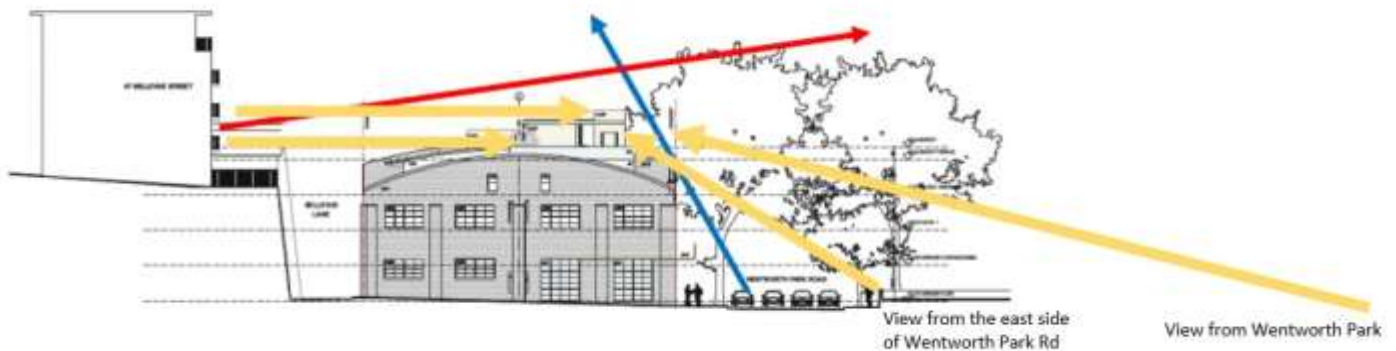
The yellow arrows show the true impact of the roof top addition on views from the Bellevue Street apartments, the eastern side of Wentworth Park Rd and from within Wentworth Park
